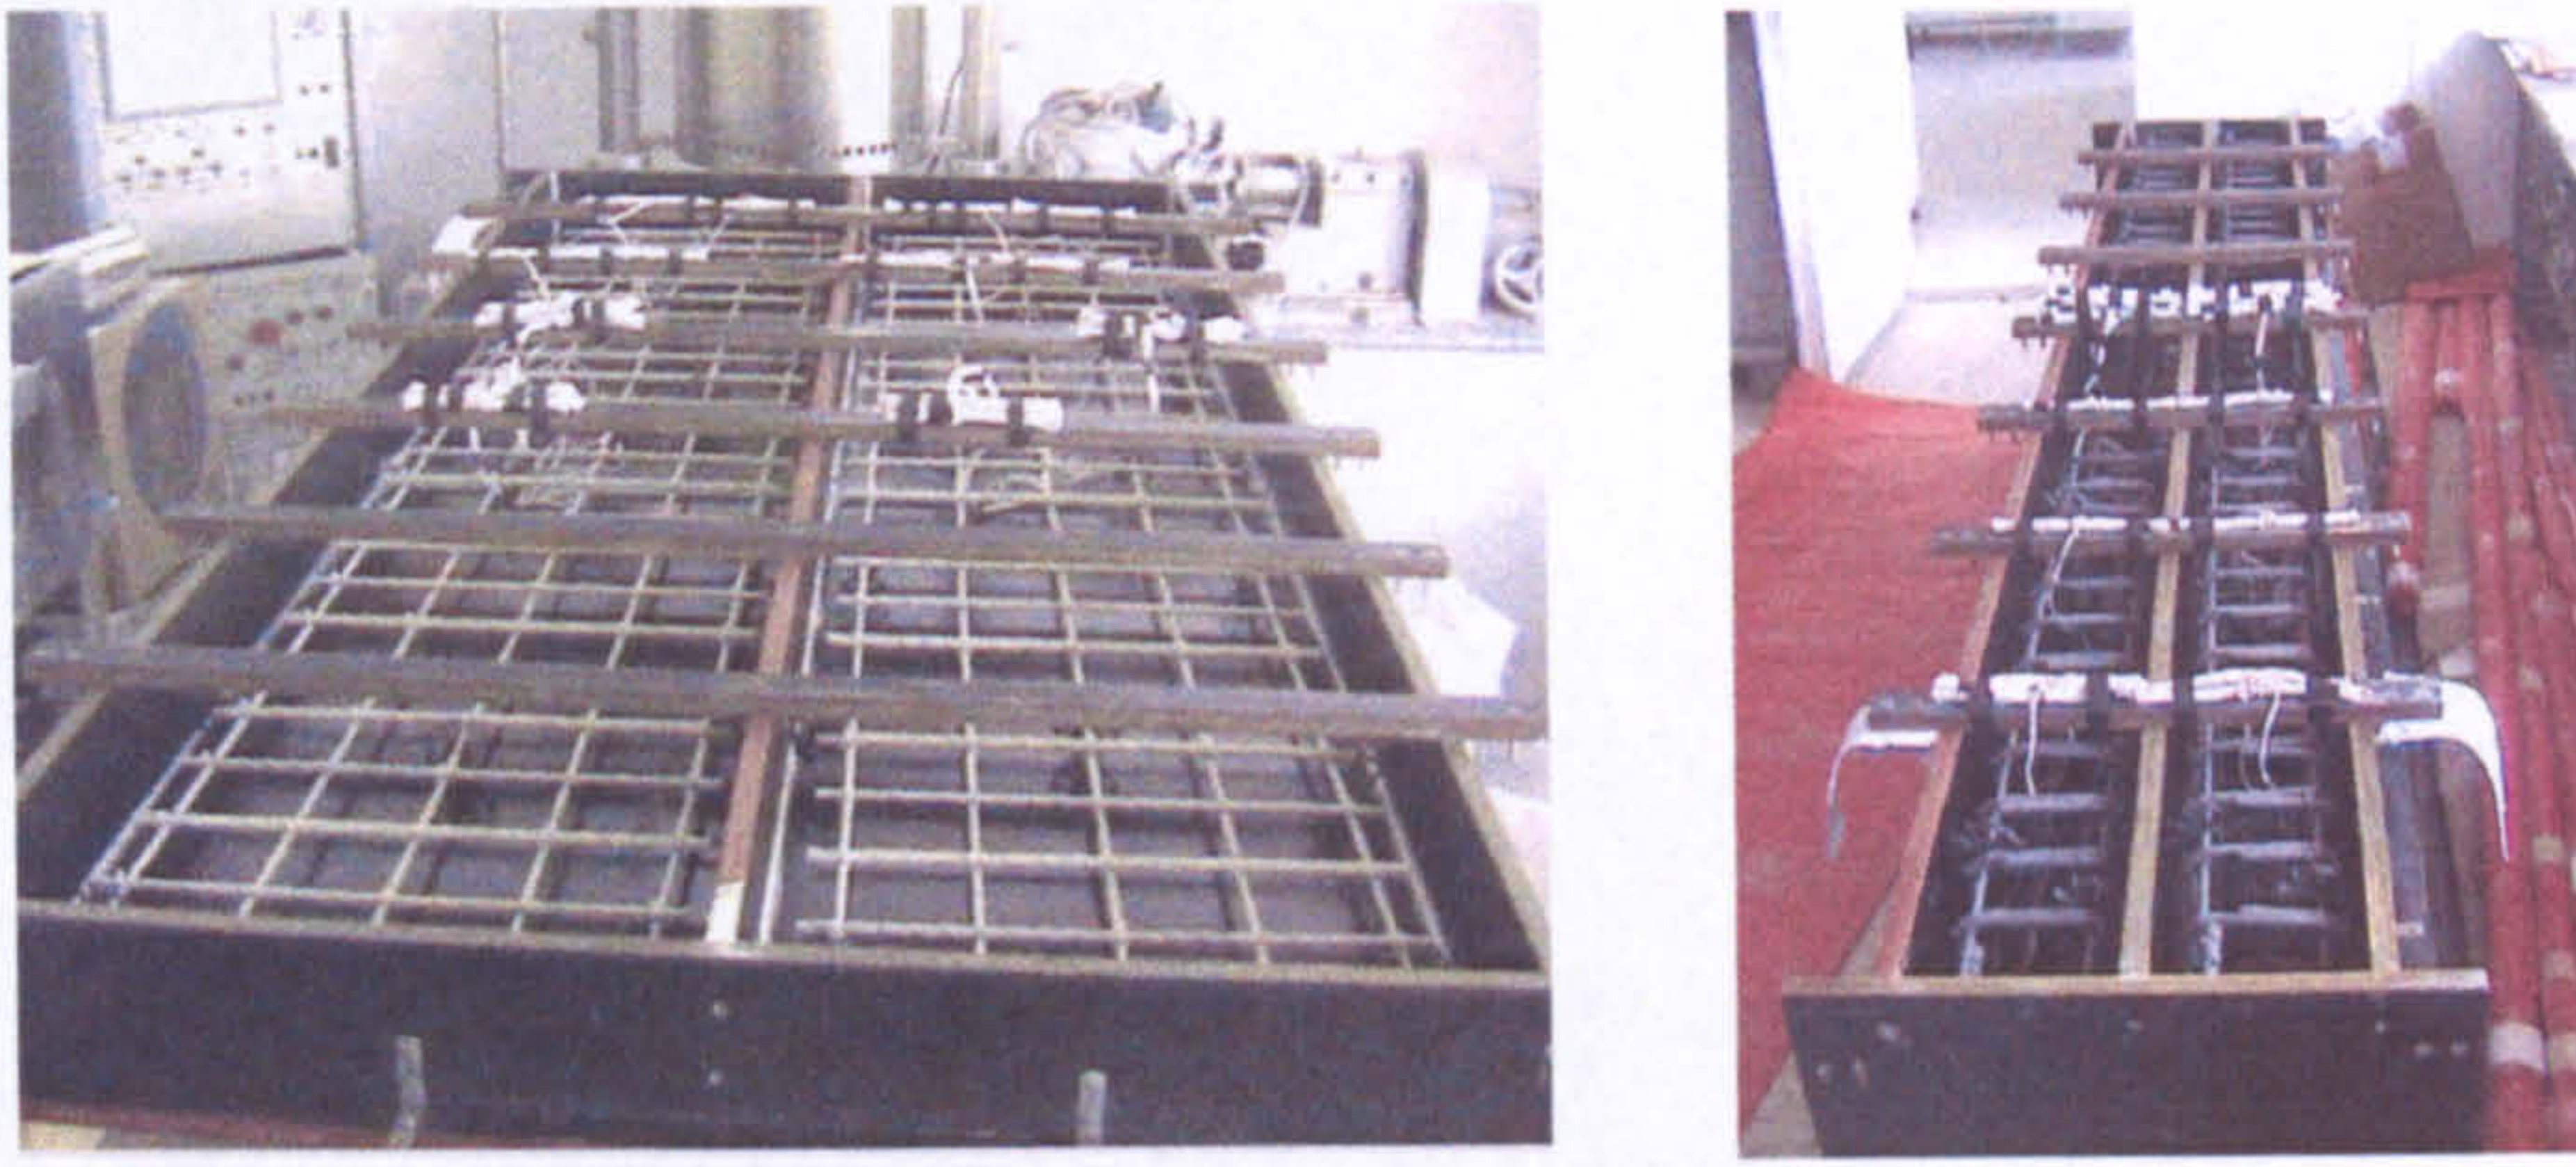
Beam and slab moulds with reinforcement, ready for casting.
